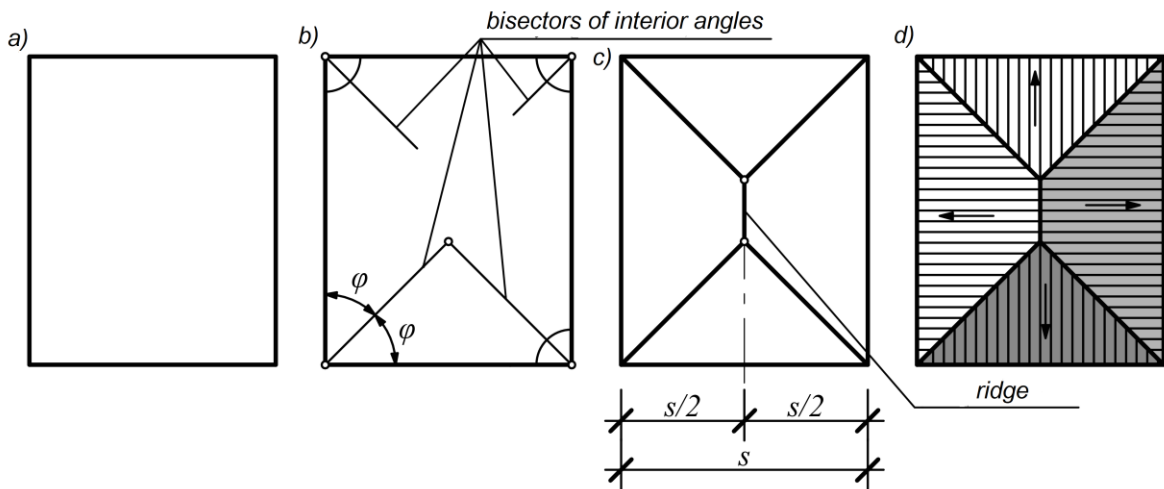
Construction of intersecting lines of the roof slopes of a rectangular shape in plan
